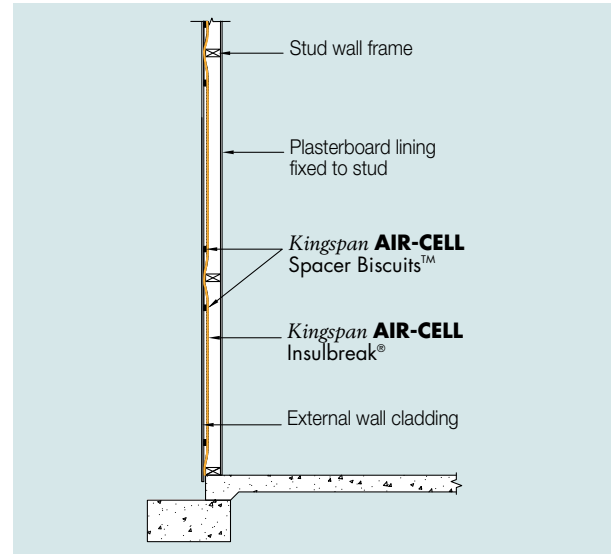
Side elevation of Kingspan AIR-CELL Insulbreak® on steel-framed wall
